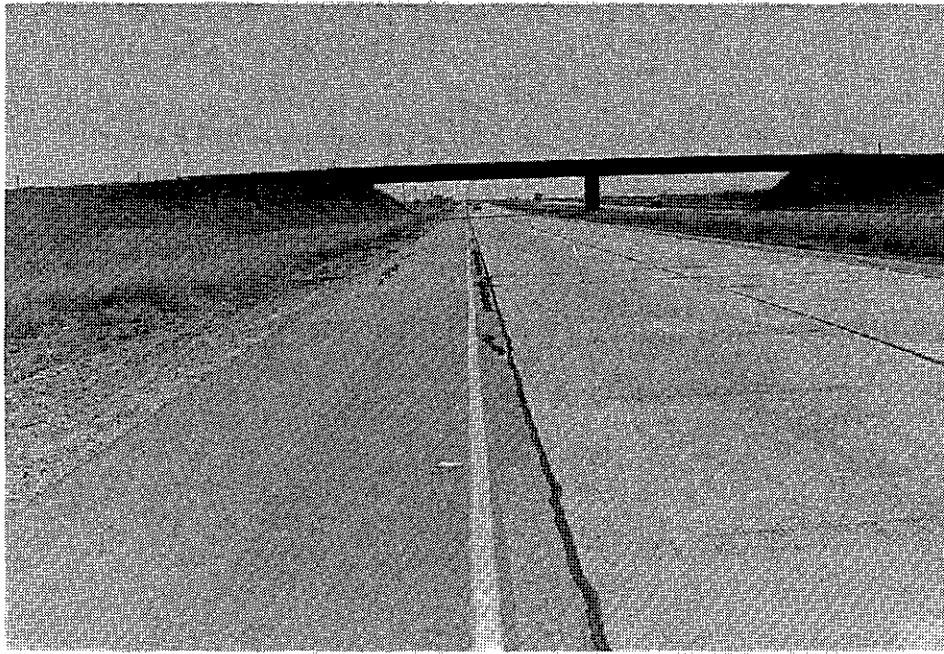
Looking south from end of ATPB base section. Note repaired cracks in adjacent control section.
